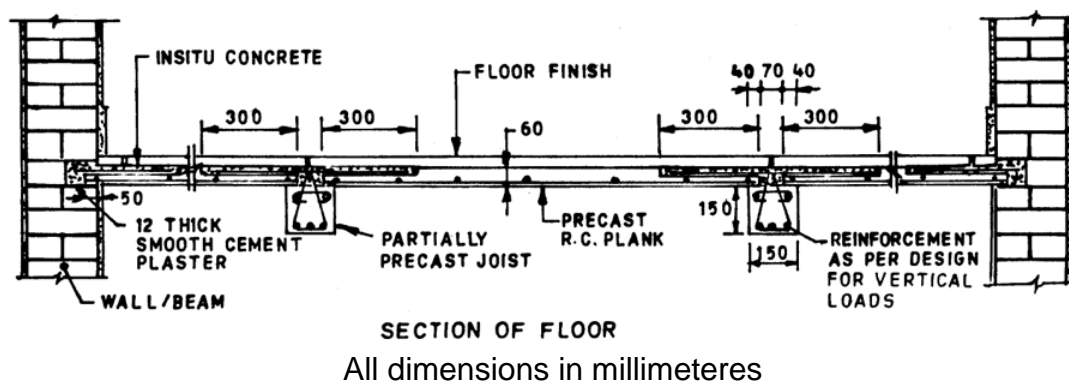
PRECAST REINFORCED PLANK FLOOR
